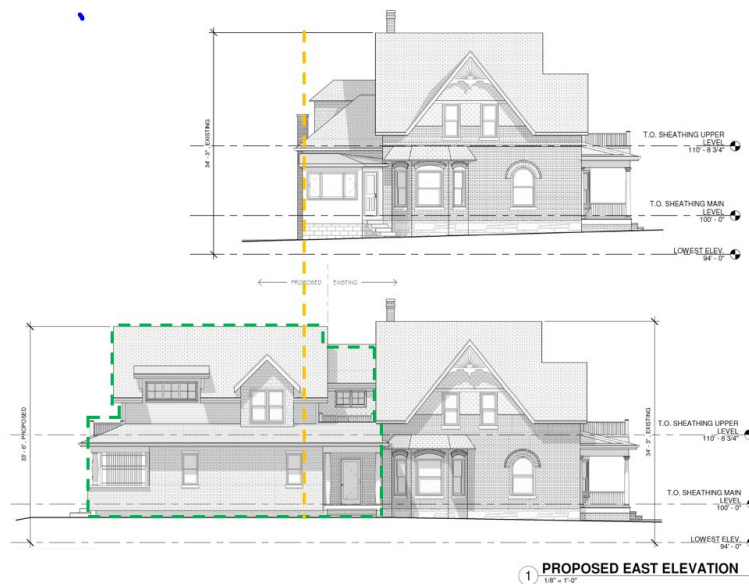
Existing above (area to be demolished in blue) and proposed below (new construction in green) east elevation
